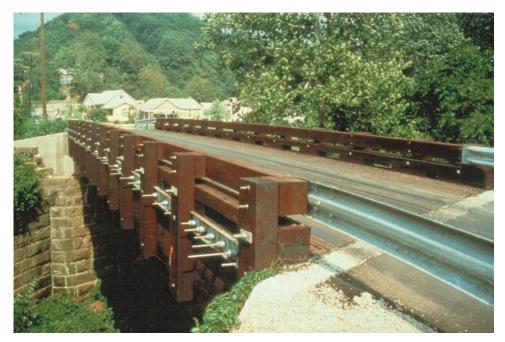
Elevation View of Stress-Laminated Timber Tee Beam Bridge (West Virginia)
